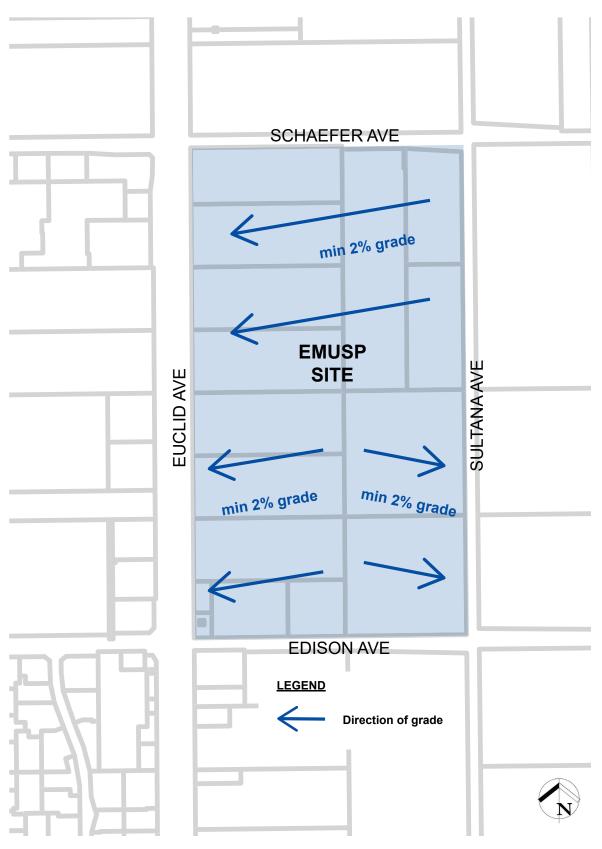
SPECIFIC PLAN CONCEPTUAL GRADING PLAN
